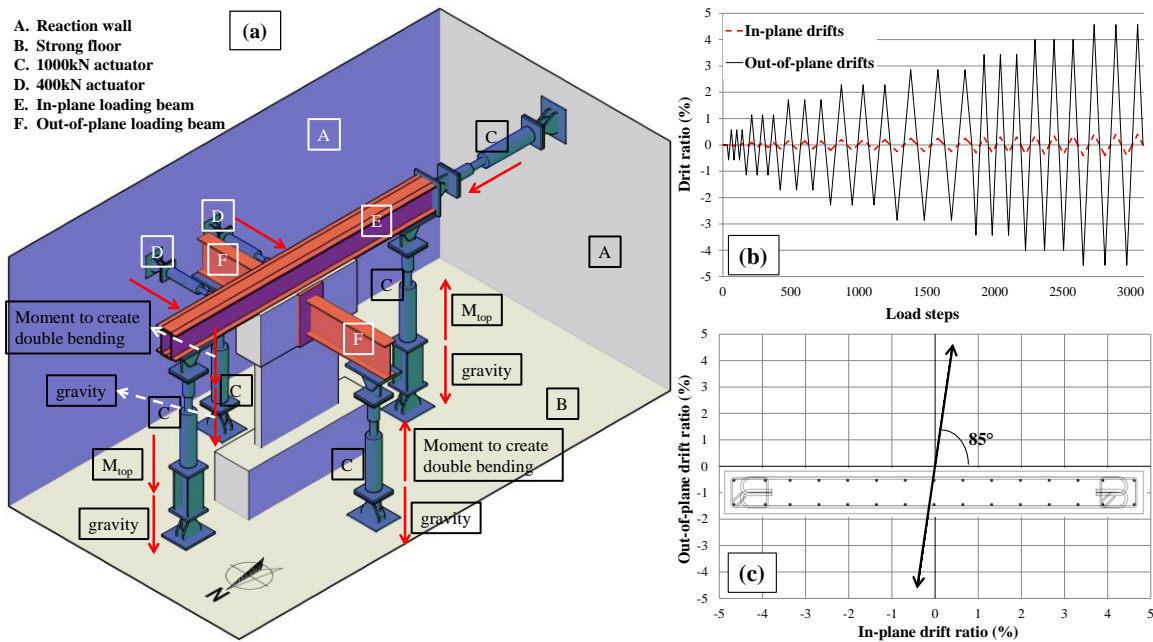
(a) schematic view of the test setup used for the specimens under bi-directional loadings and (b & c) loading protocol used for the experiment
